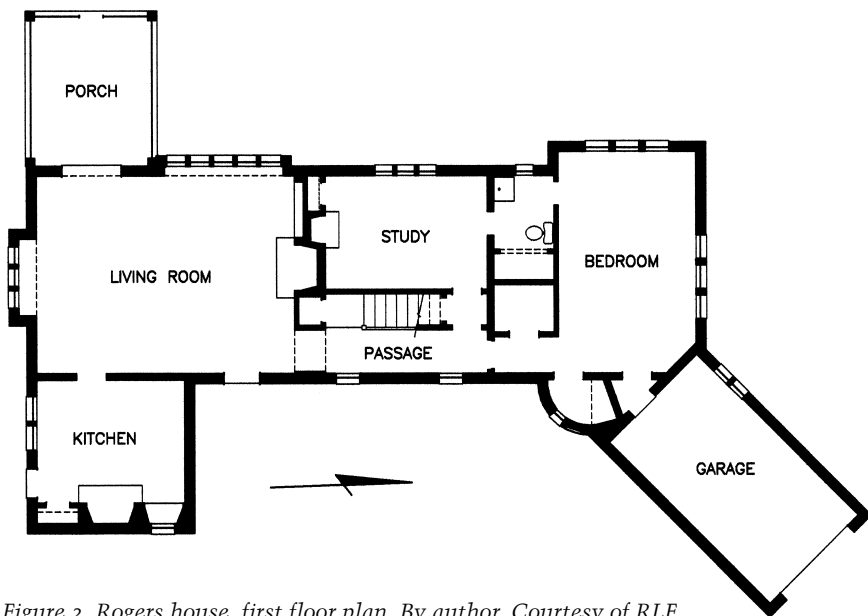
Rogers house, first floor plan. By author. Courtesy of RLF.
